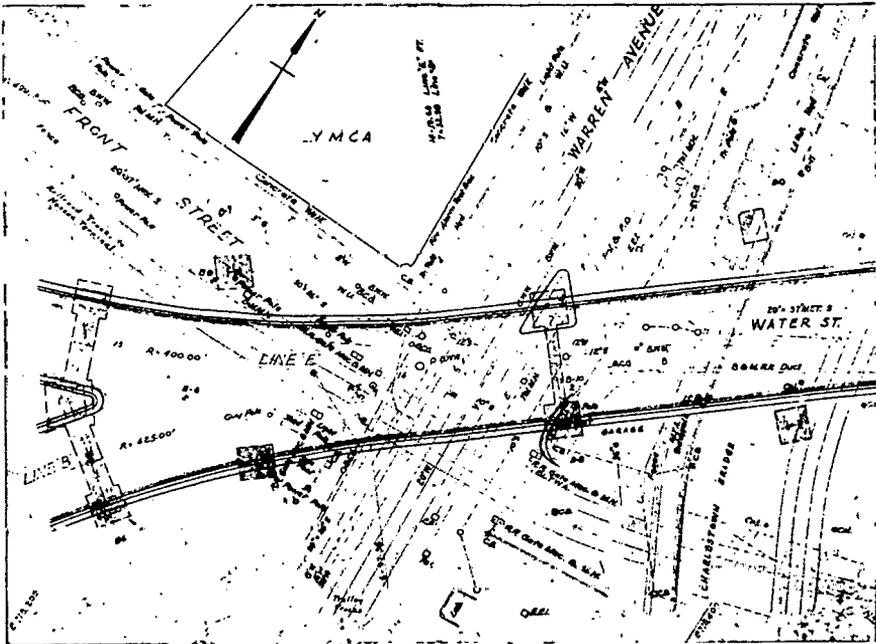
PORTION OF SURVEY PLAN, CHARLESTOWN.
